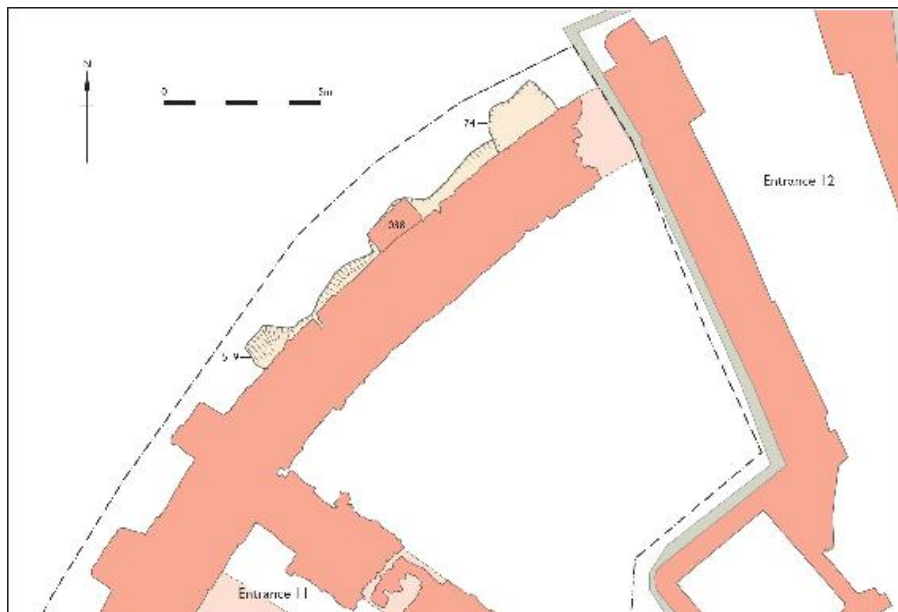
Outline plan of the outer wall between Entrances 11 and 12 in Area A showing surviving pilaster base and probable positions of robbed pilaster bases.
